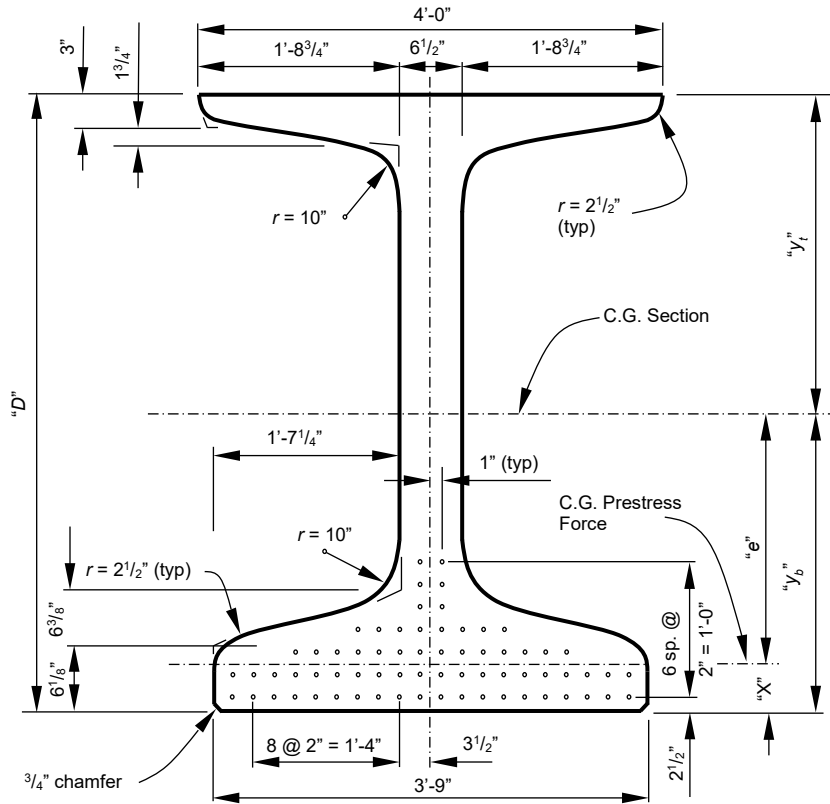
California Standard Pretensioned “Wide-Flange” Girder Typical Section
